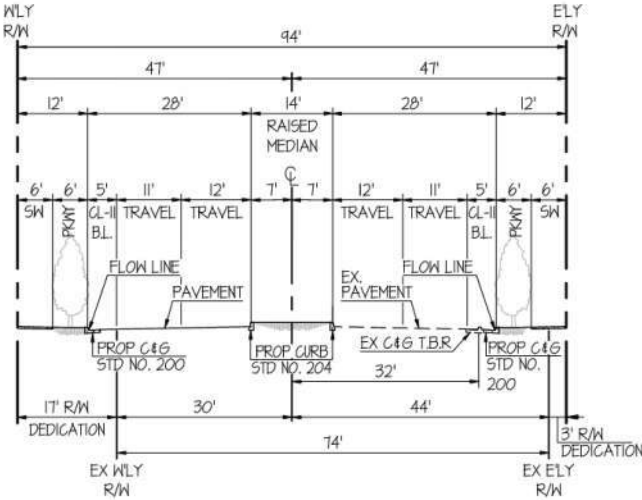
, Standard Street Sections – Secondary Arterial (Frontage Road)
